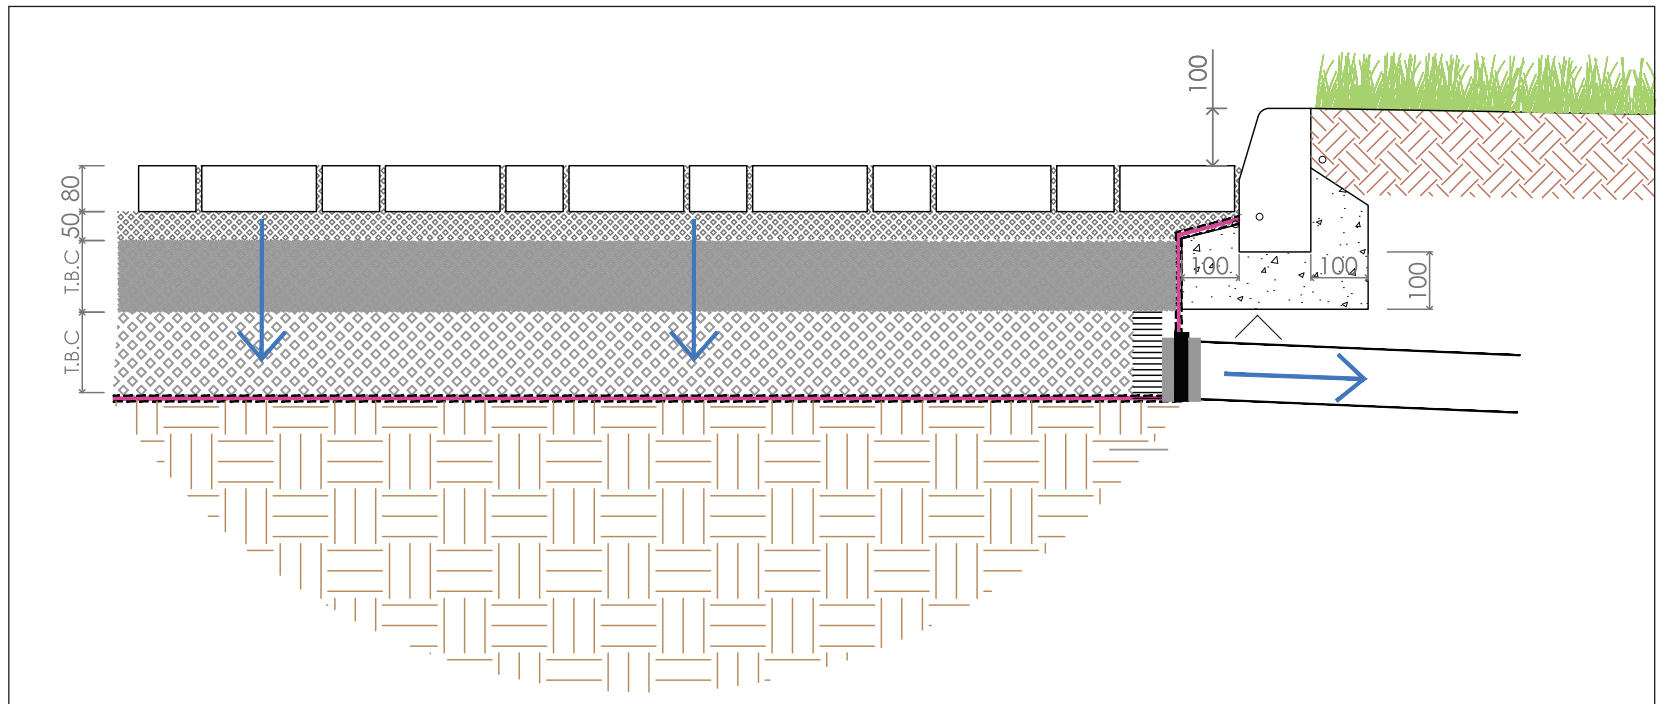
DETAILING PERMEABLE PAVING & SUDS WITH PRECAST CONCRETE PRODUCTS
